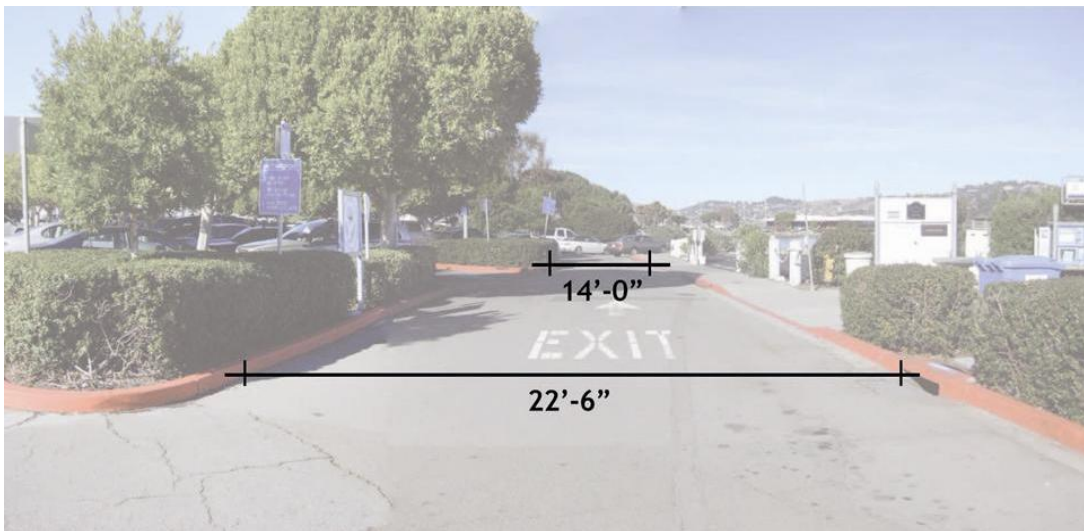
Segment 1A Parking Lot 1 Existing Conditions
